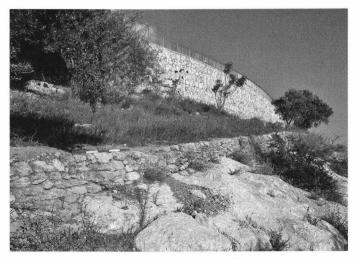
Step 3-3: Road toward Nazareth (revetment wall restored)
